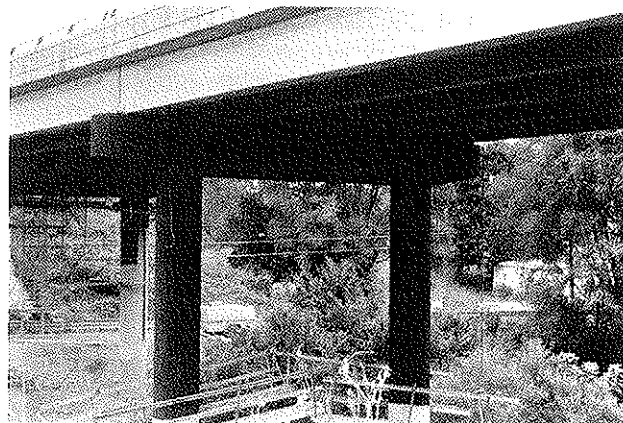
Pier 3 of Structure 2014 after application of the conductive coating.
